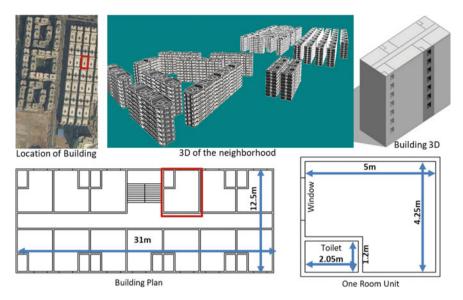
Building location, typical floor plan, and 3D model used for simulation
